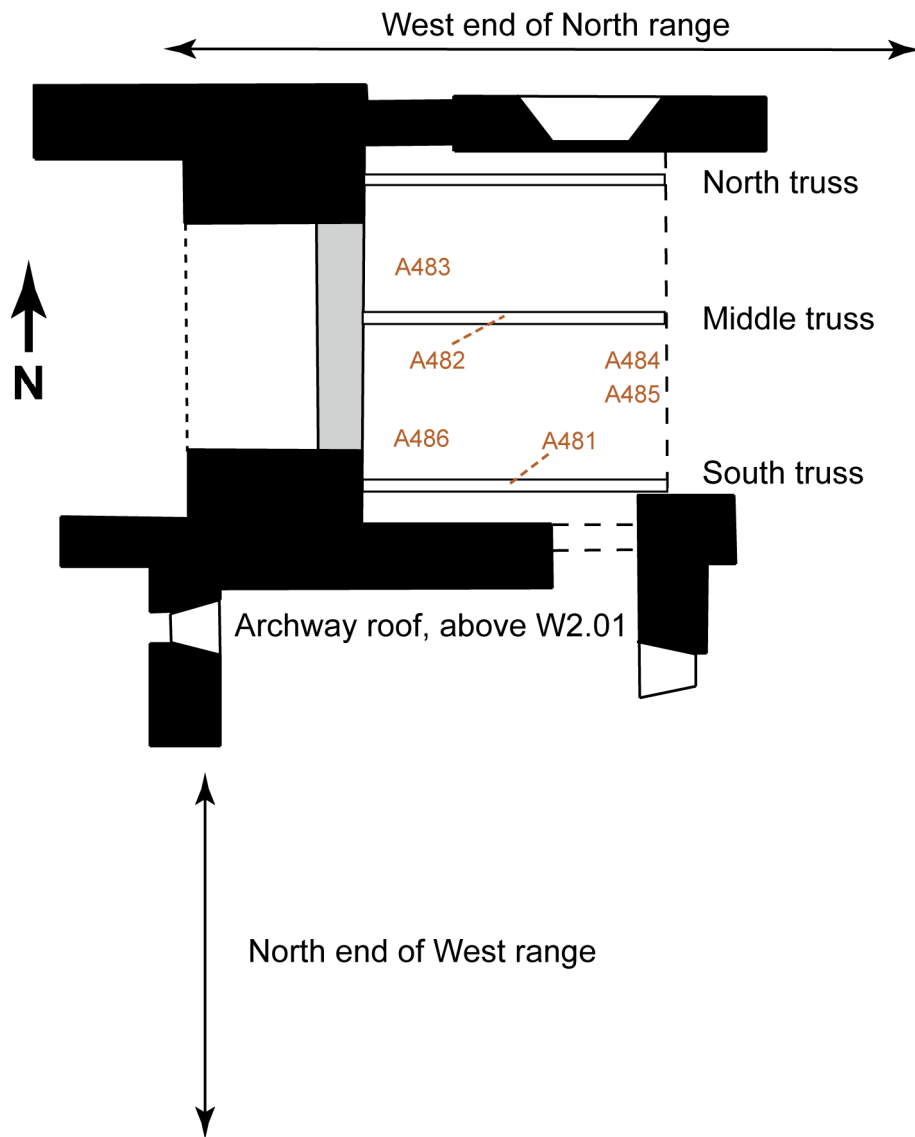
Archway roof above W2.01, showing the locations of samples APT-A481–6
